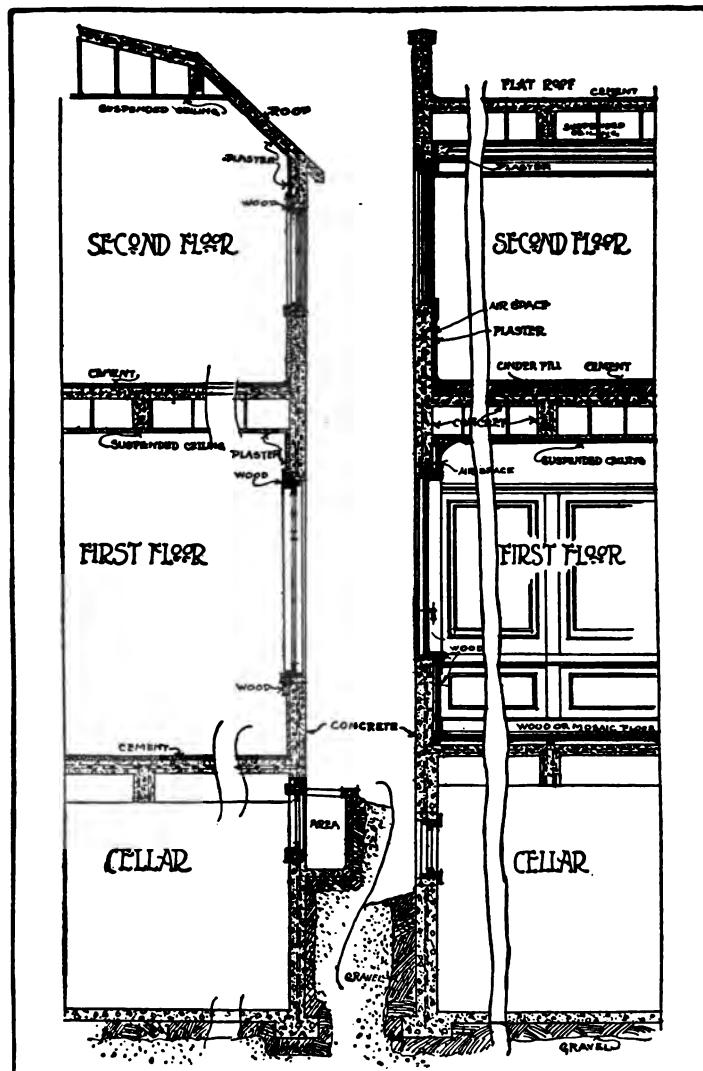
Section of a Concrete Fire-Proof House with Solid Walls Reinforced with Steel Rods.
